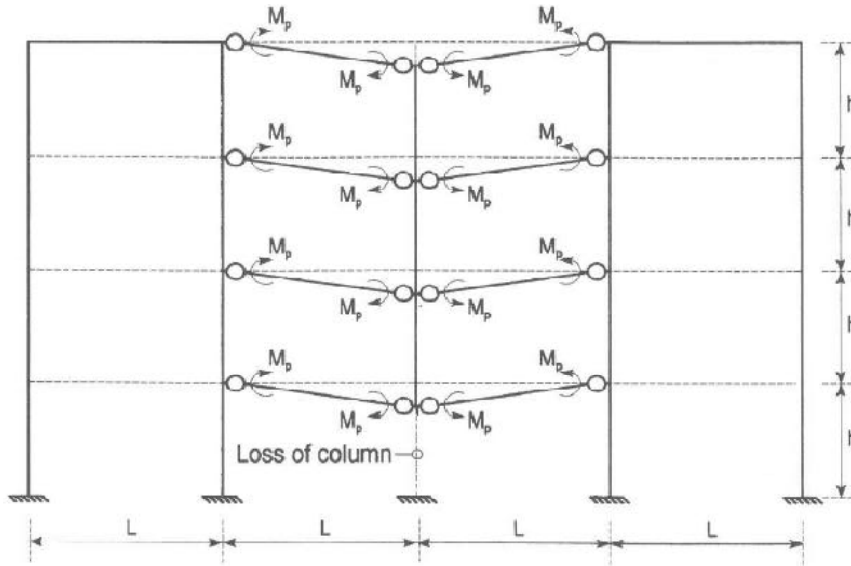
Plastic collapse mechanism due to loss of a column in a structural frame.
